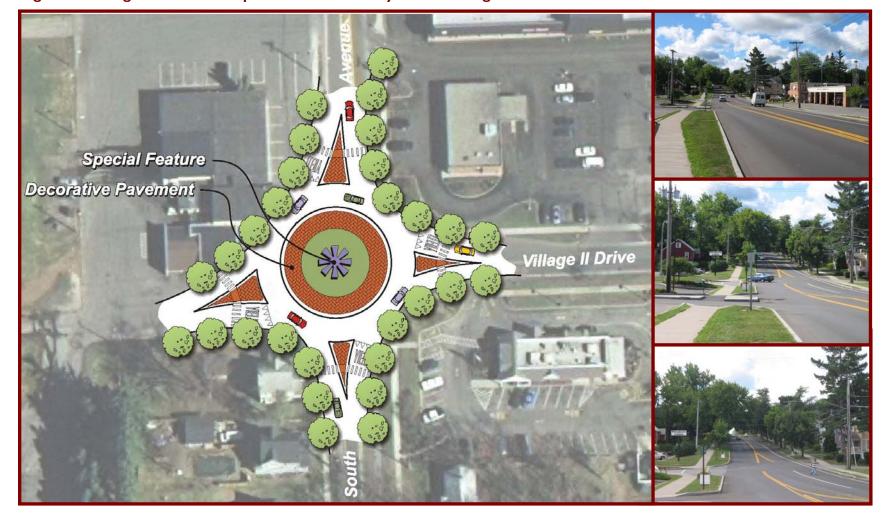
Village II Drive Conceptual Roundabout Layout & Existing Condition Photos
